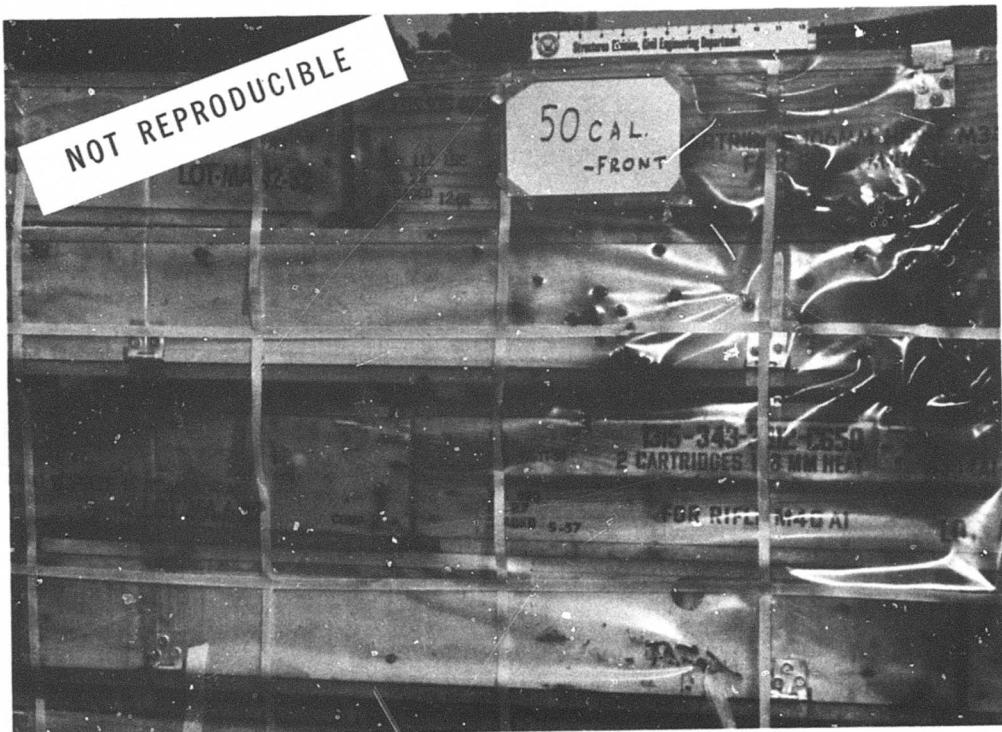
Damage to test wall (front) from 50-caliber machine gun fire.
